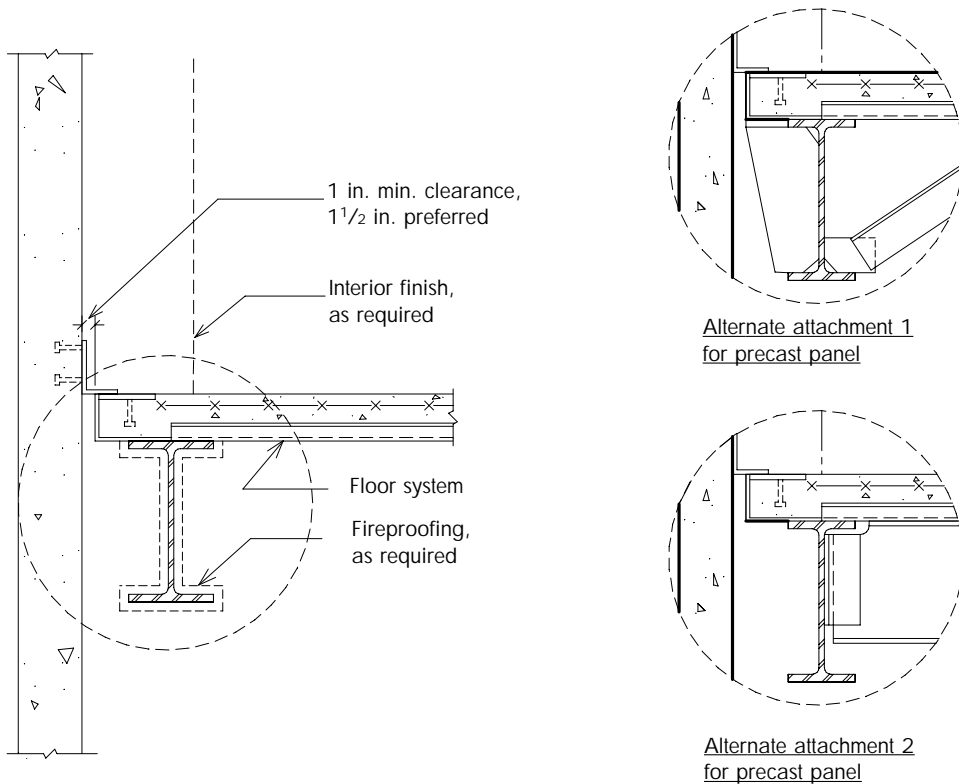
Detailing Considerations for Precast Concrete Panels (Sample Plan Detail for Horizontal Span Precast Panels)
